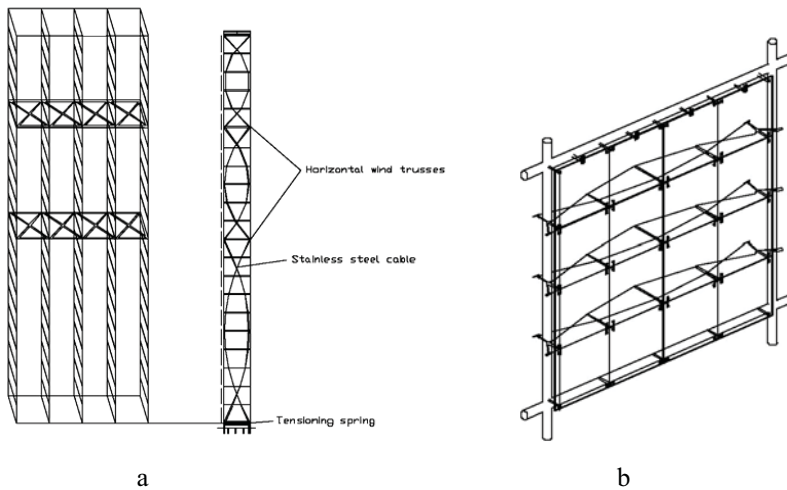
a, b. Steel-glass façades: a)-hybrid-supported glass façade; b)-cable supported suspended glass façade [6]
